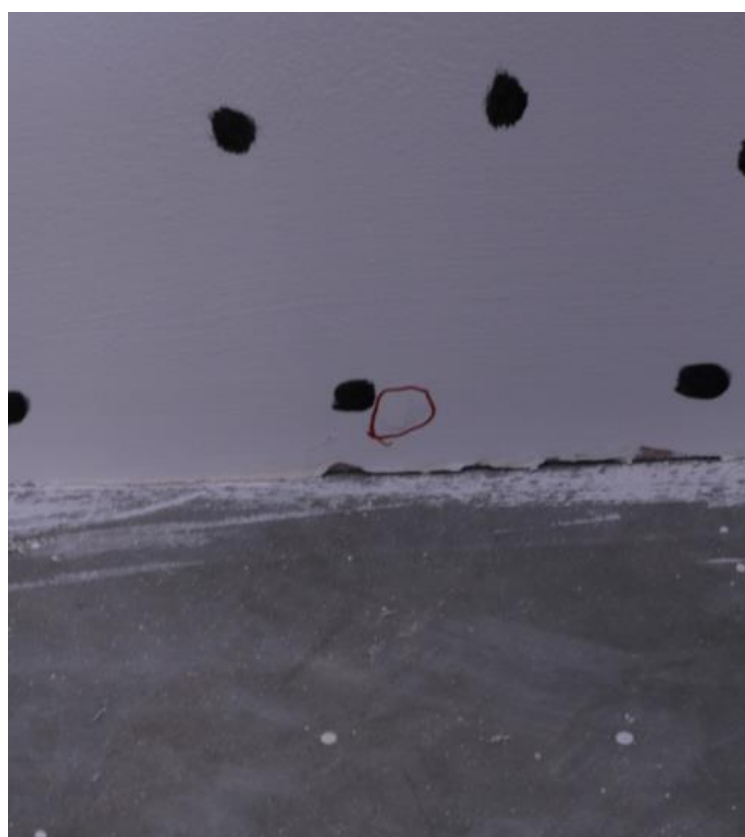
Specimen A1 – Step 11 – DS1c: Popping of bottom track screw fixing head– location 3
